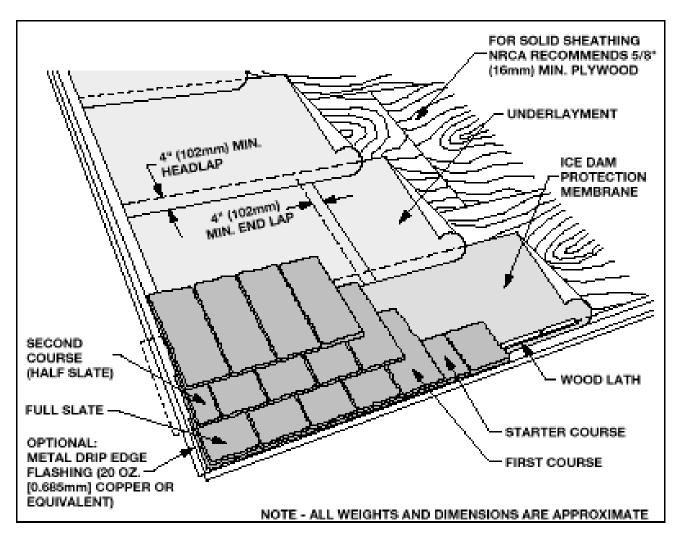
Example showing layout of ice dam protection membrane, 1 ply underlayment, and slate.
